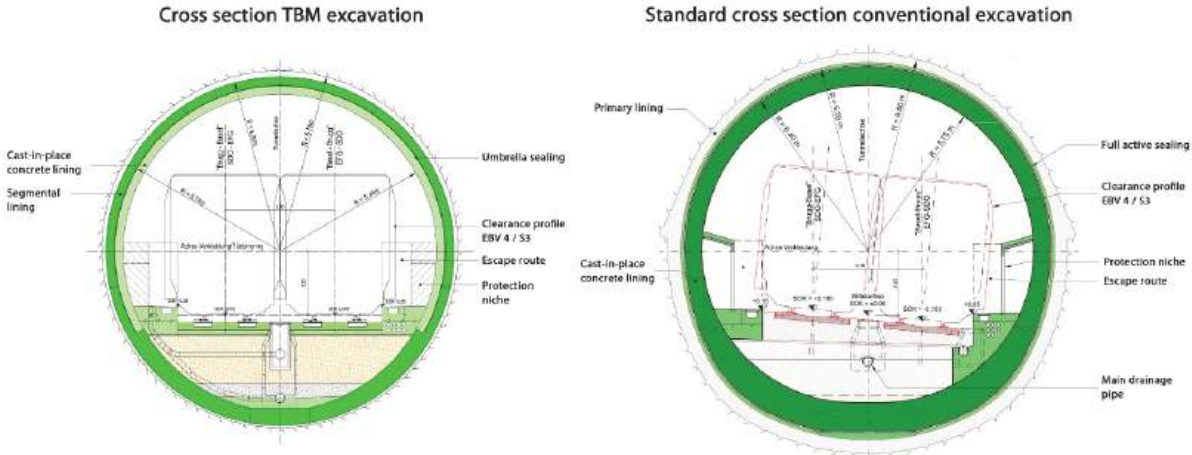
Cross section of TBM tunnel (left) and conventional tunnel (right)
